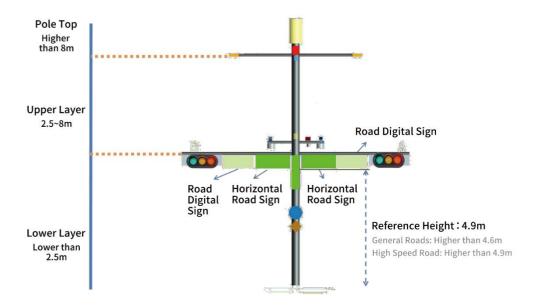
Diagram of Type 2 Hanging Mount Equipment
